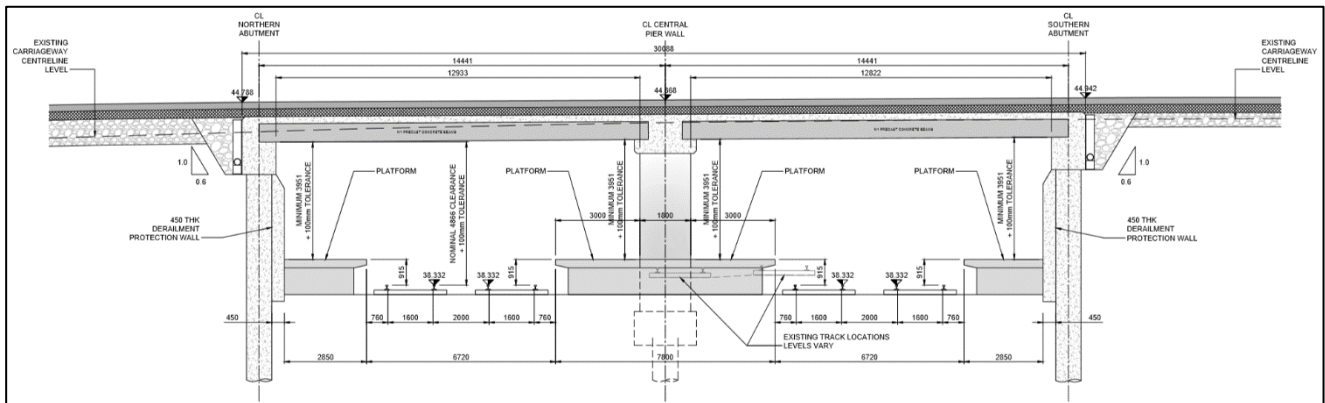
Typical 2-span bridge section (Potential future platforms shown indicatively) – Facing East
